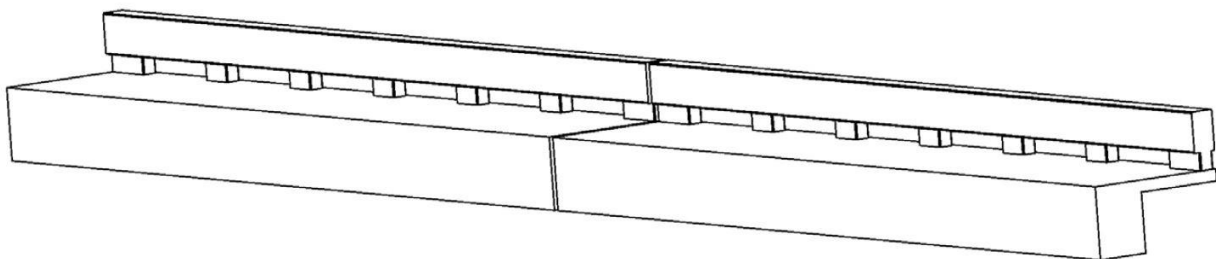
Preliminary Open Concrete Bridge Rail and Deck Configuration
